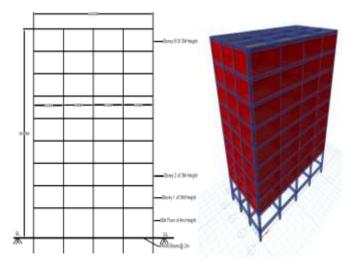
2D and 3D Elevation of Structure with Mass Irregularity at Stilt Floor
